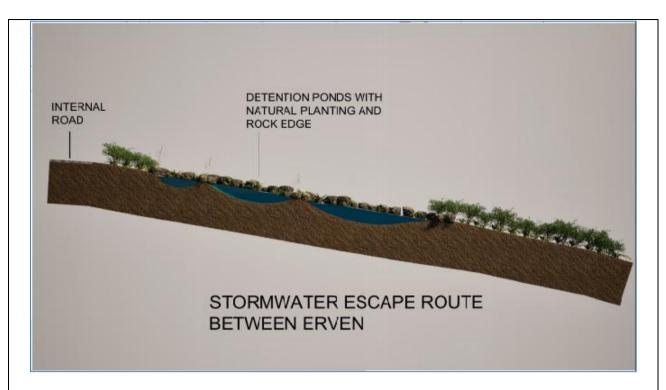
Stormwater escape route between erven as per Stormwater Plan
